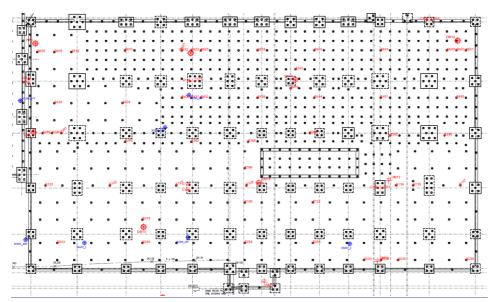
Pile layout for the DSM5 building - red piles mark the test pileg
